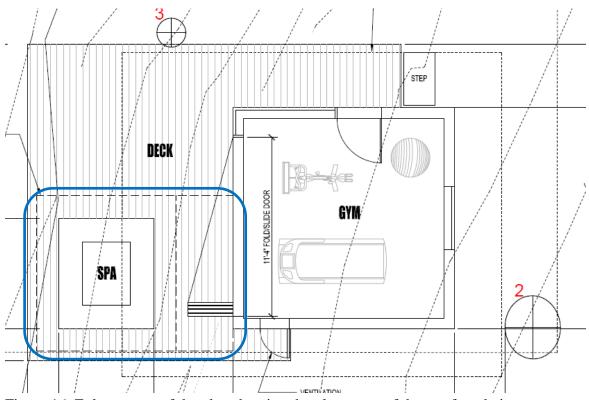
Enlargement of the plan showing the placement of the spa foundation. The SE corner of the building will be quite close to the base of the #2 cedar but floating on pile posts. Impact should be minimized.
